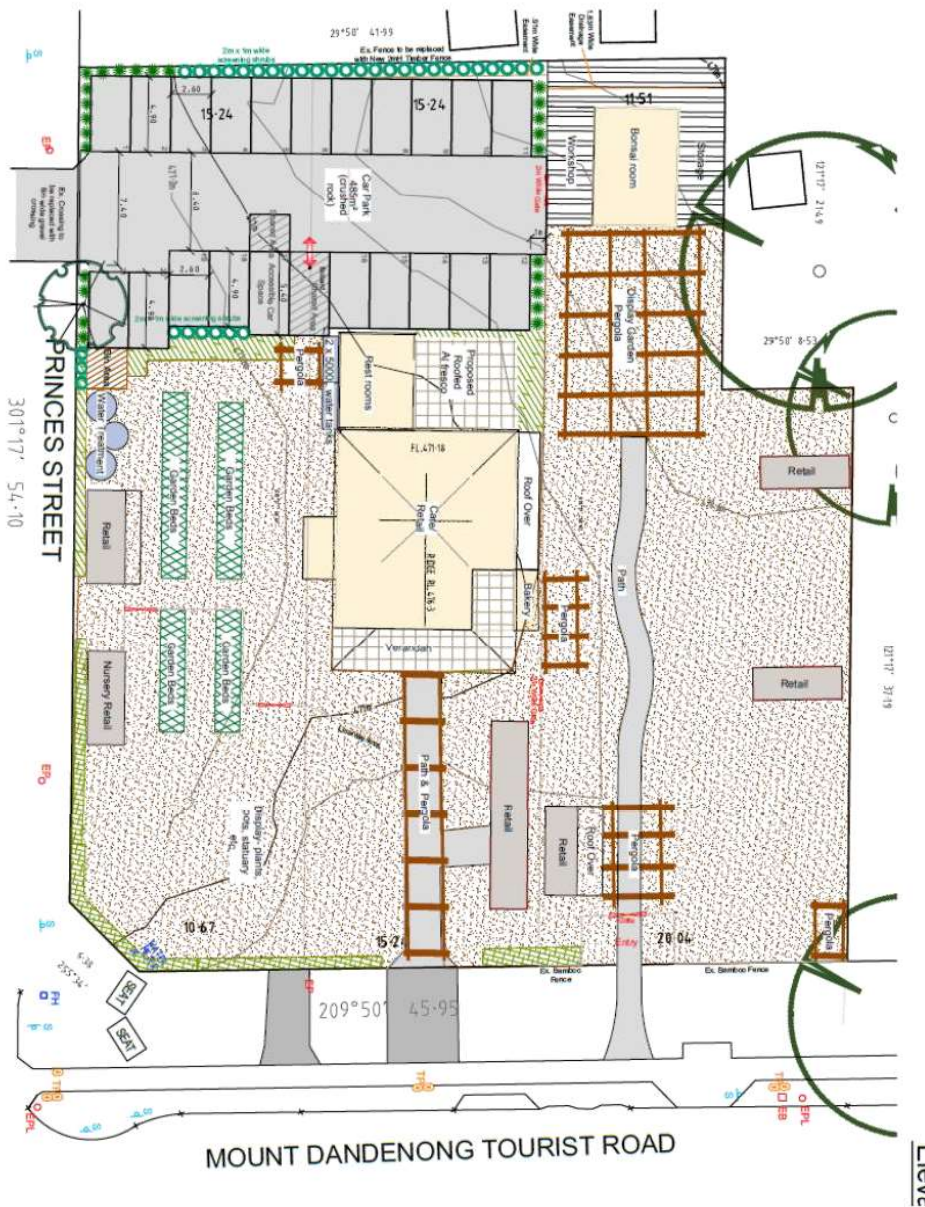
Indicative layout (refer to the Site Plan 15382P3)
